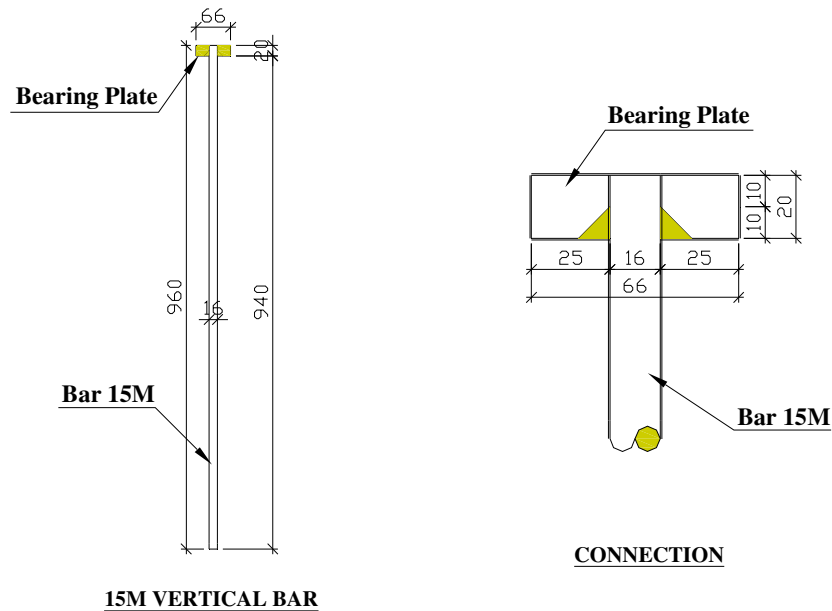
Vertical bar with bearing plate (dimensions in mm).
